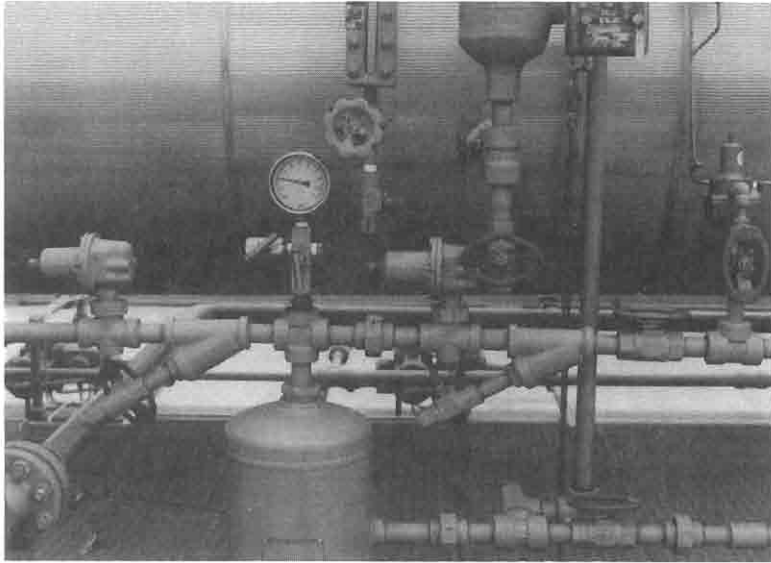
Two self-contained pressure regulators in a fuel gas piping system. An internal diaphragm and spring automatically adjust the opening in the valve to maintain pressure.
